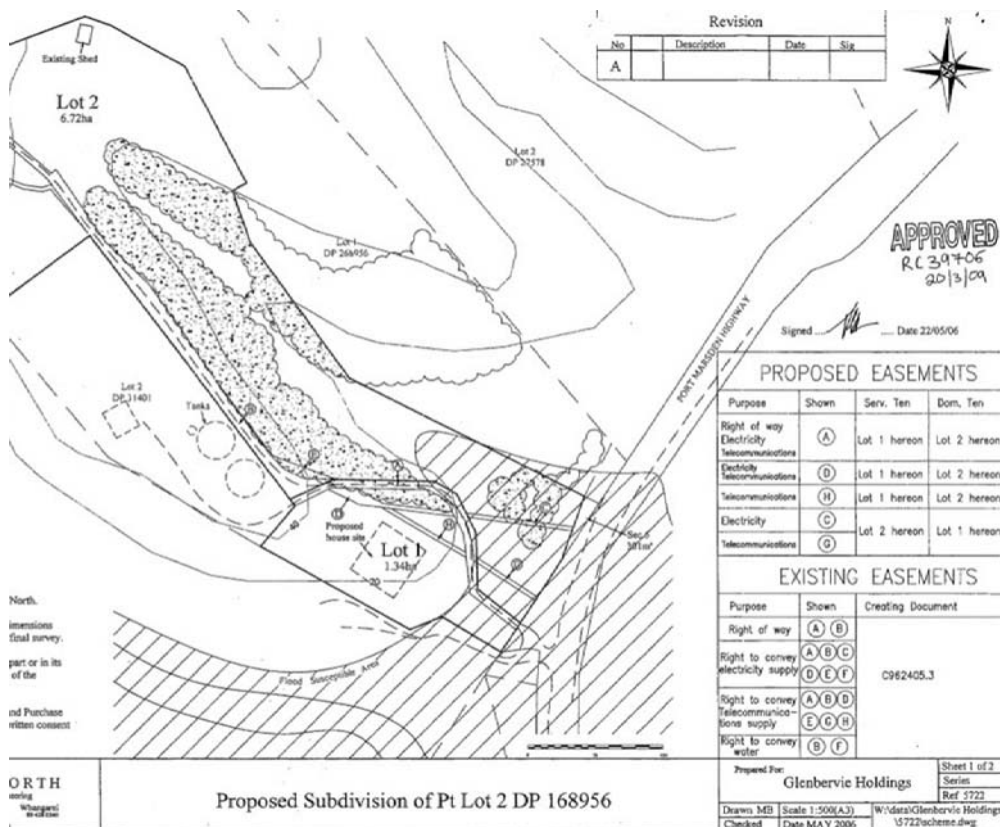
Subdivision plan showing easements over Lot 1 and Lot 2 DP 459956
